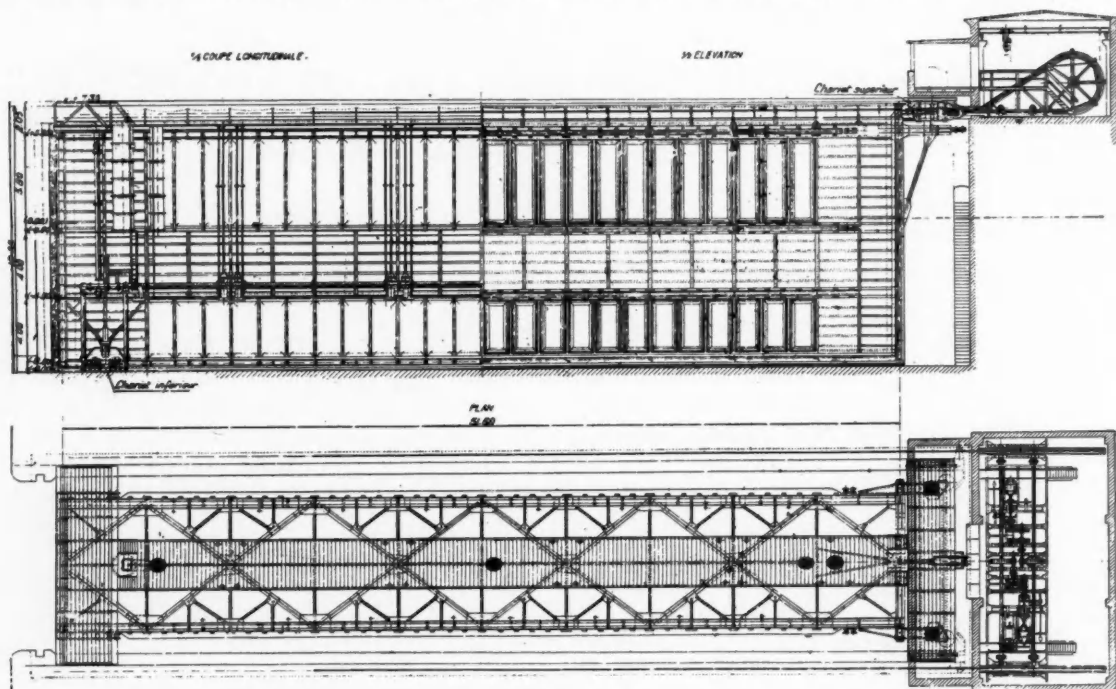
Outer Gate: Plan, half-longitudinal section and half-elevation.
